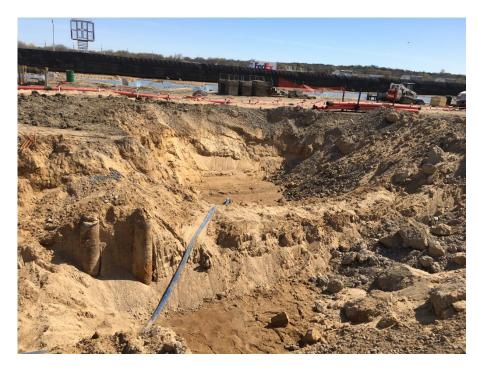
Building footing trench looking north (4/1/21; 08:44)
